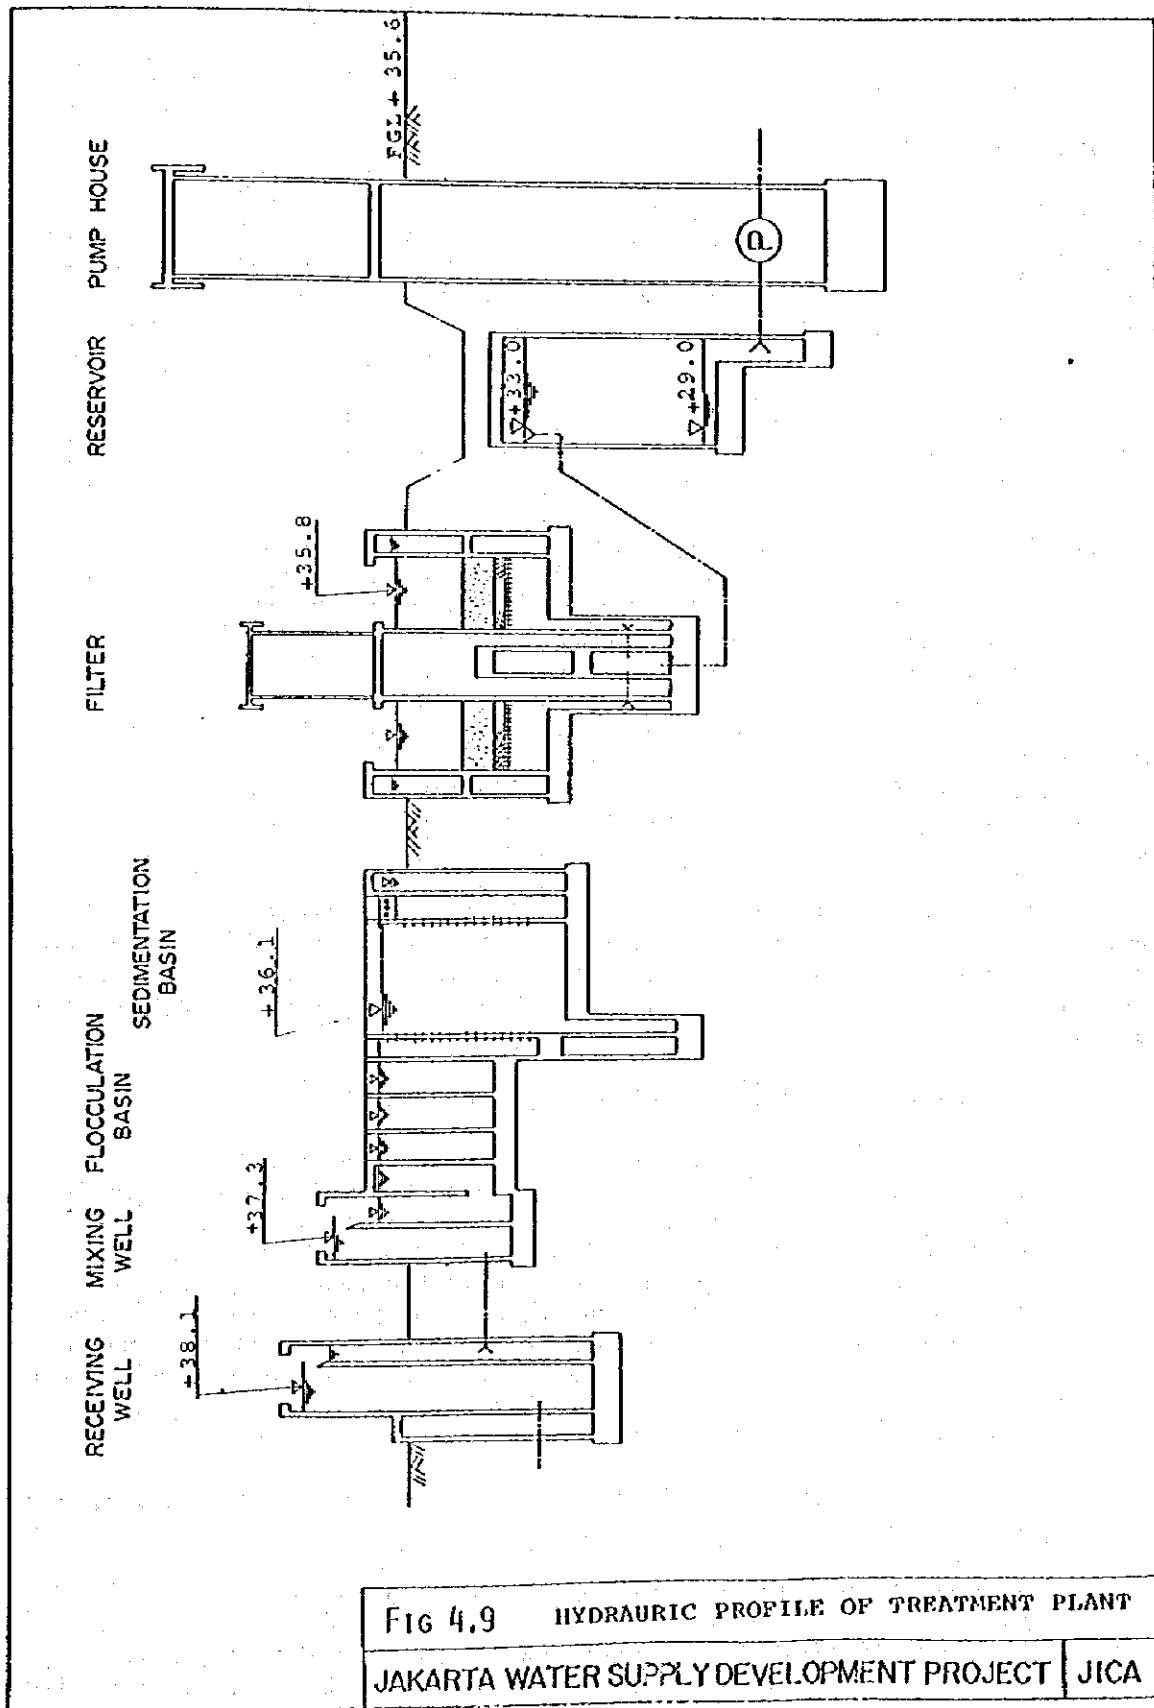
HYDRAURIC PROFILE OF TREATMENT PLANT
